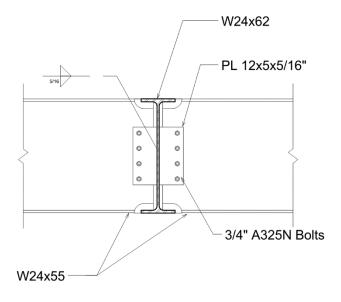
TYPICAL GREENHOUSE BEAM TO GIRDER CONNECTION
